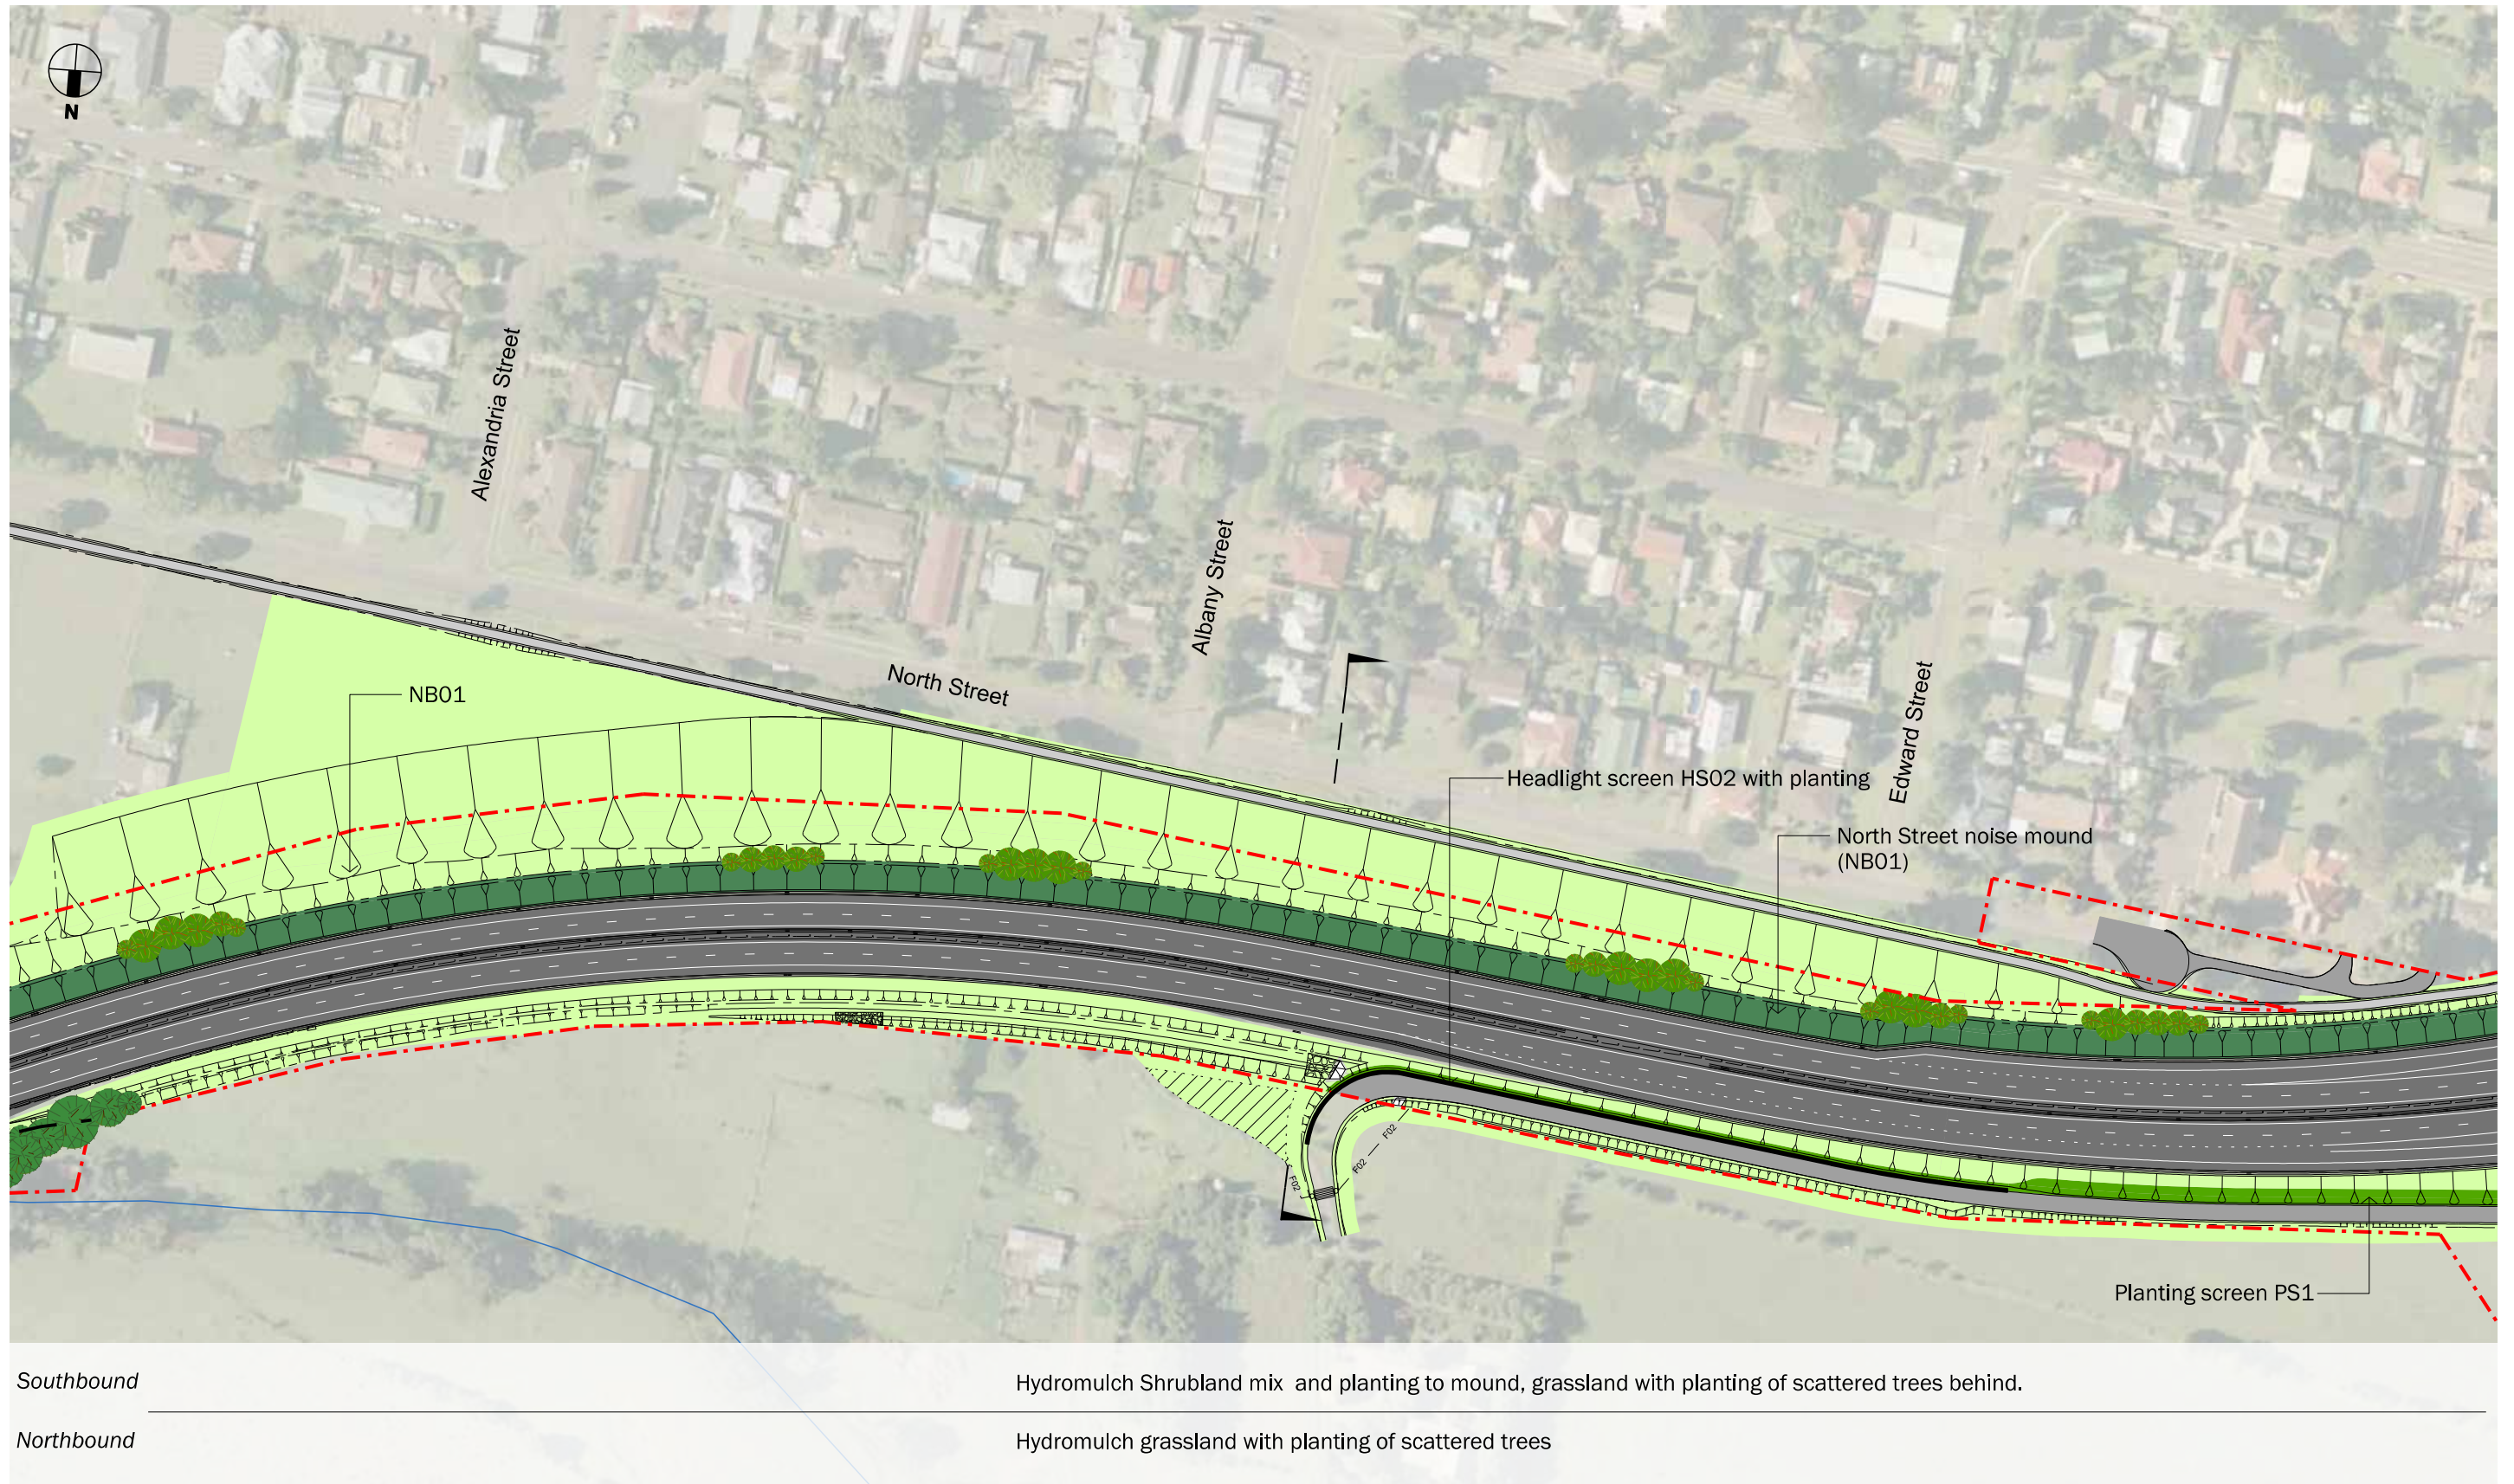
Urban and landscape design plan (Sheet 17) - Berry Character Zone
